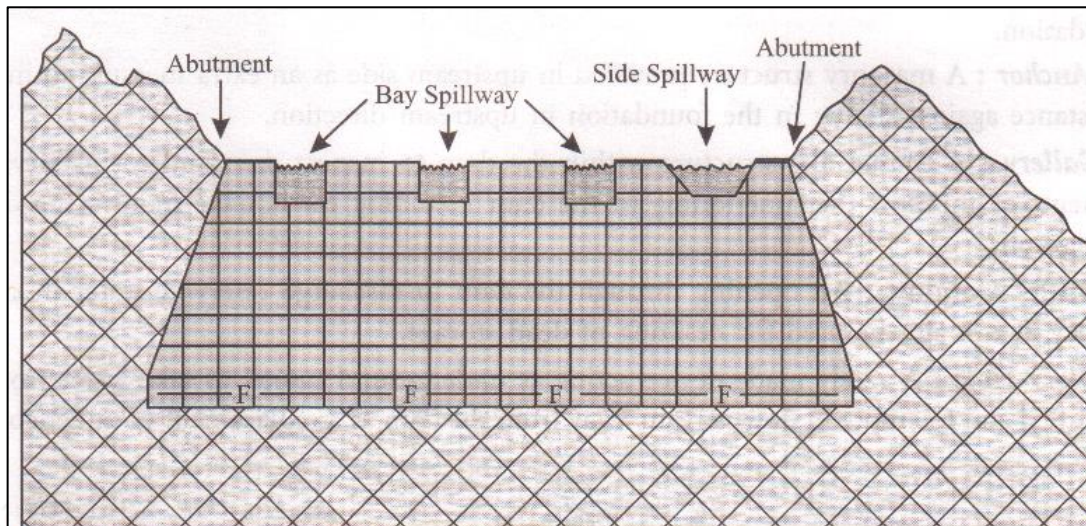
A masonry dam showing abutment, overflowing ‘bay’ spillway and side spillway.
